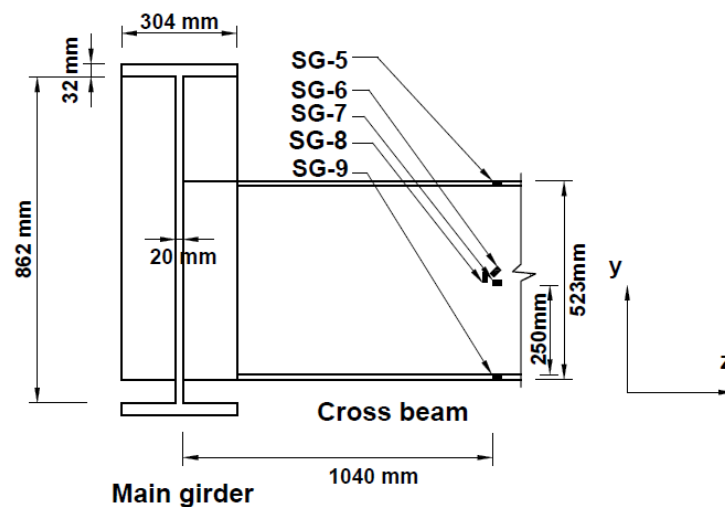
Schematic of weldable strain gauges installed to top, bottom flanges and mid web of cross beam (front view).
